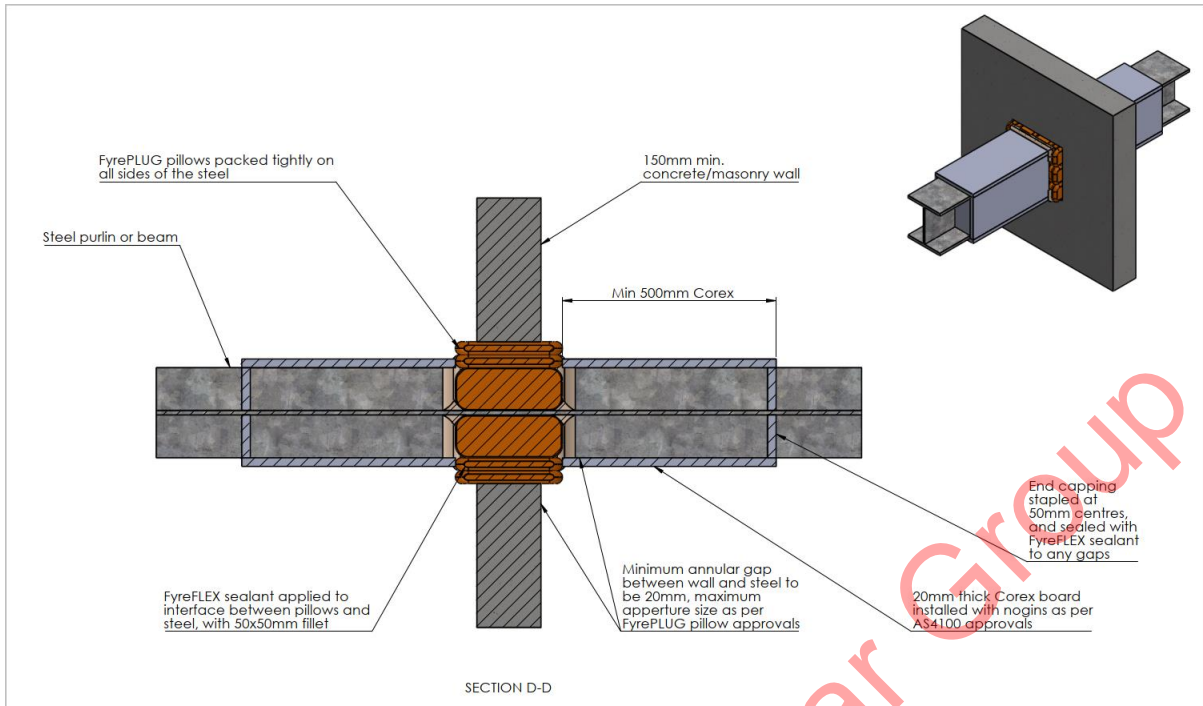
Proposed steel beam/purlin penetration system – detail 4
